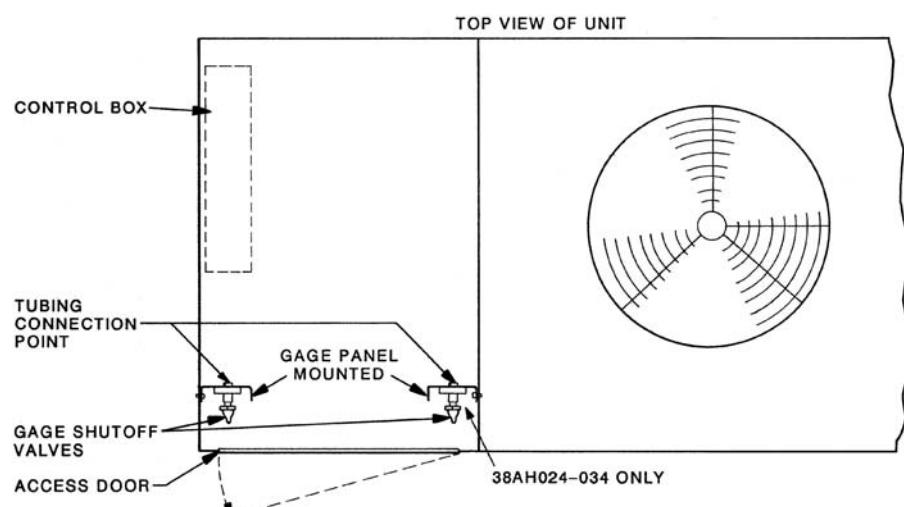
Gage Panel on 38AH024-034 and 38AKS028-044
